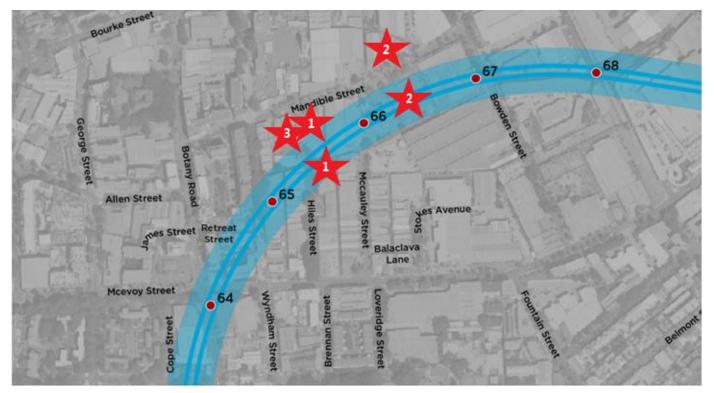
Location of subject sites in relation to the proposed tunnel alignment and corridor.
